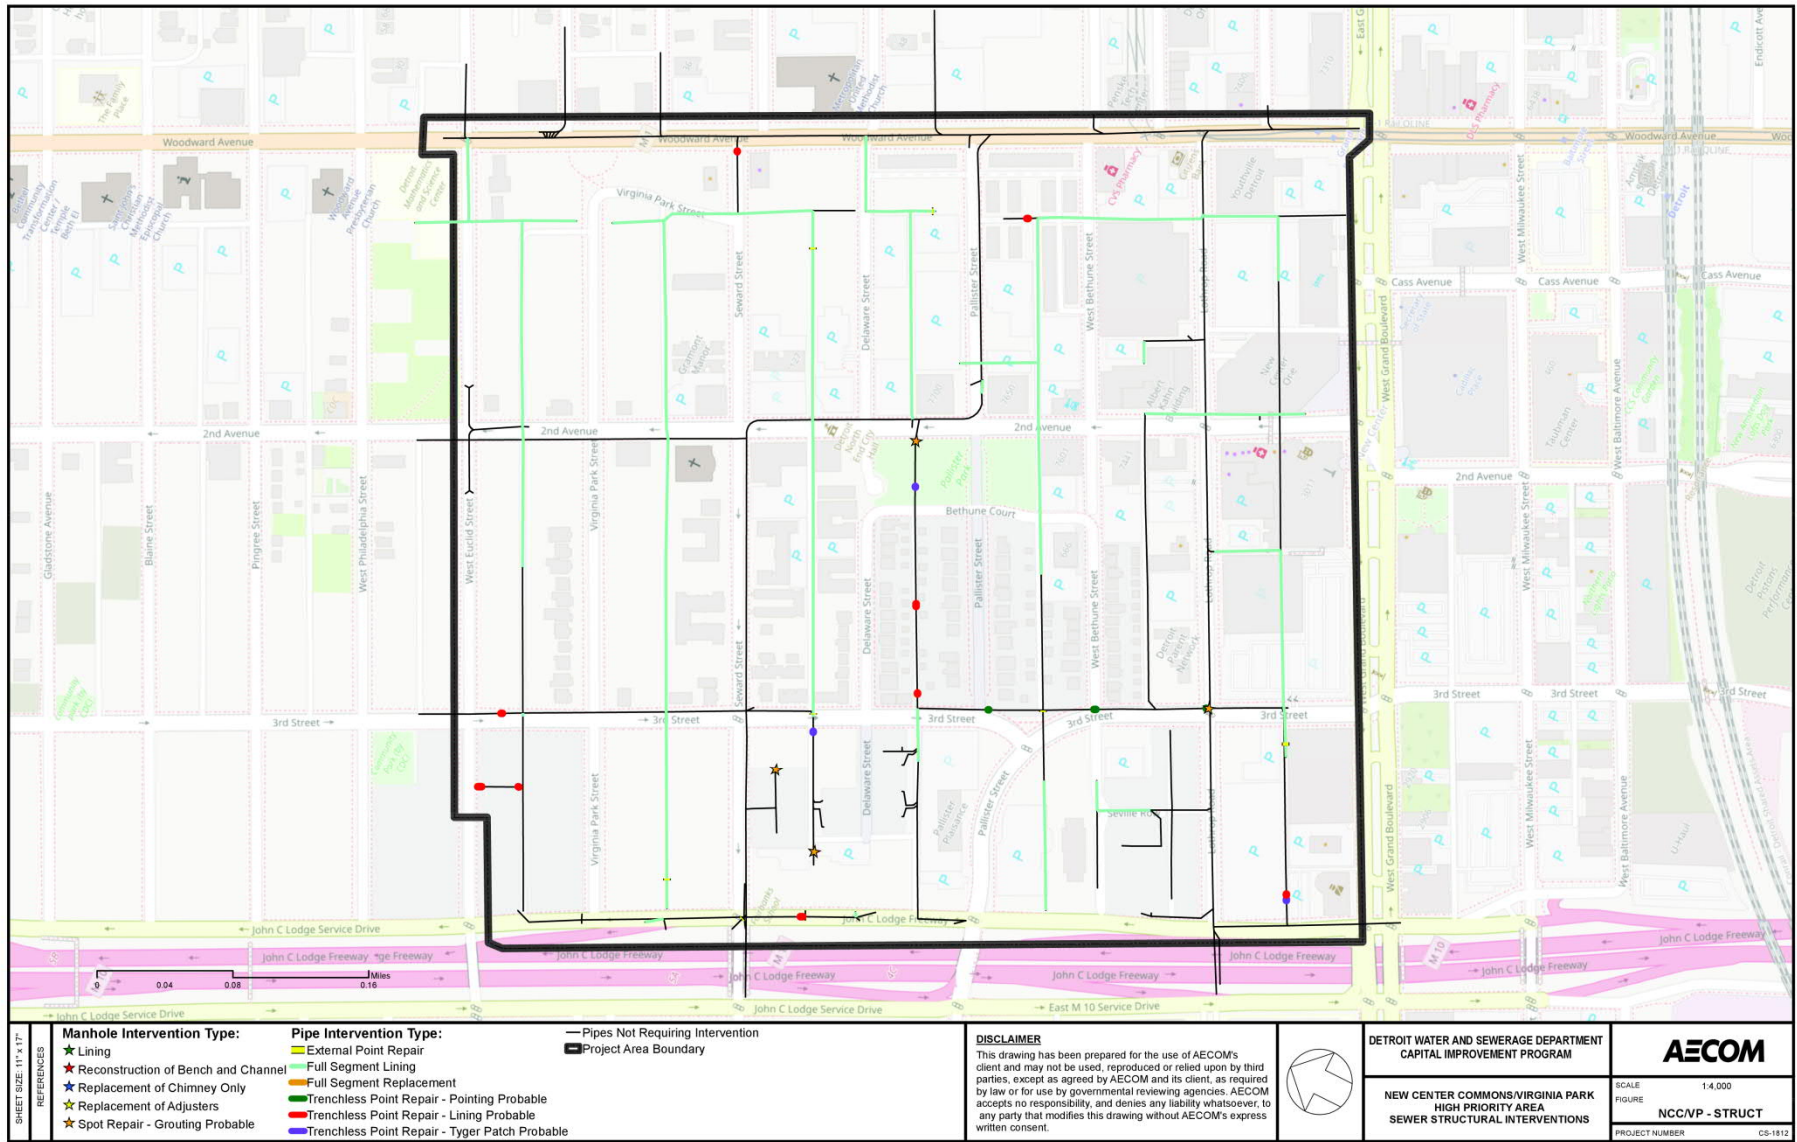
New Common Center/Virginia Park Sewer Structural Repairs
